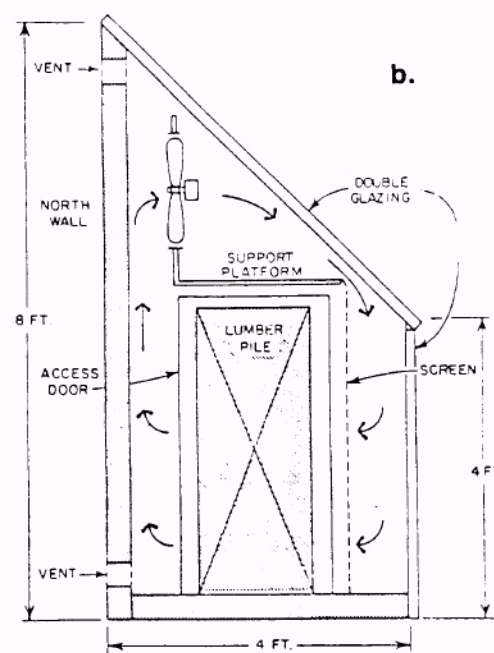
Cross section of a simple greenhouse type timber dryer [54]
